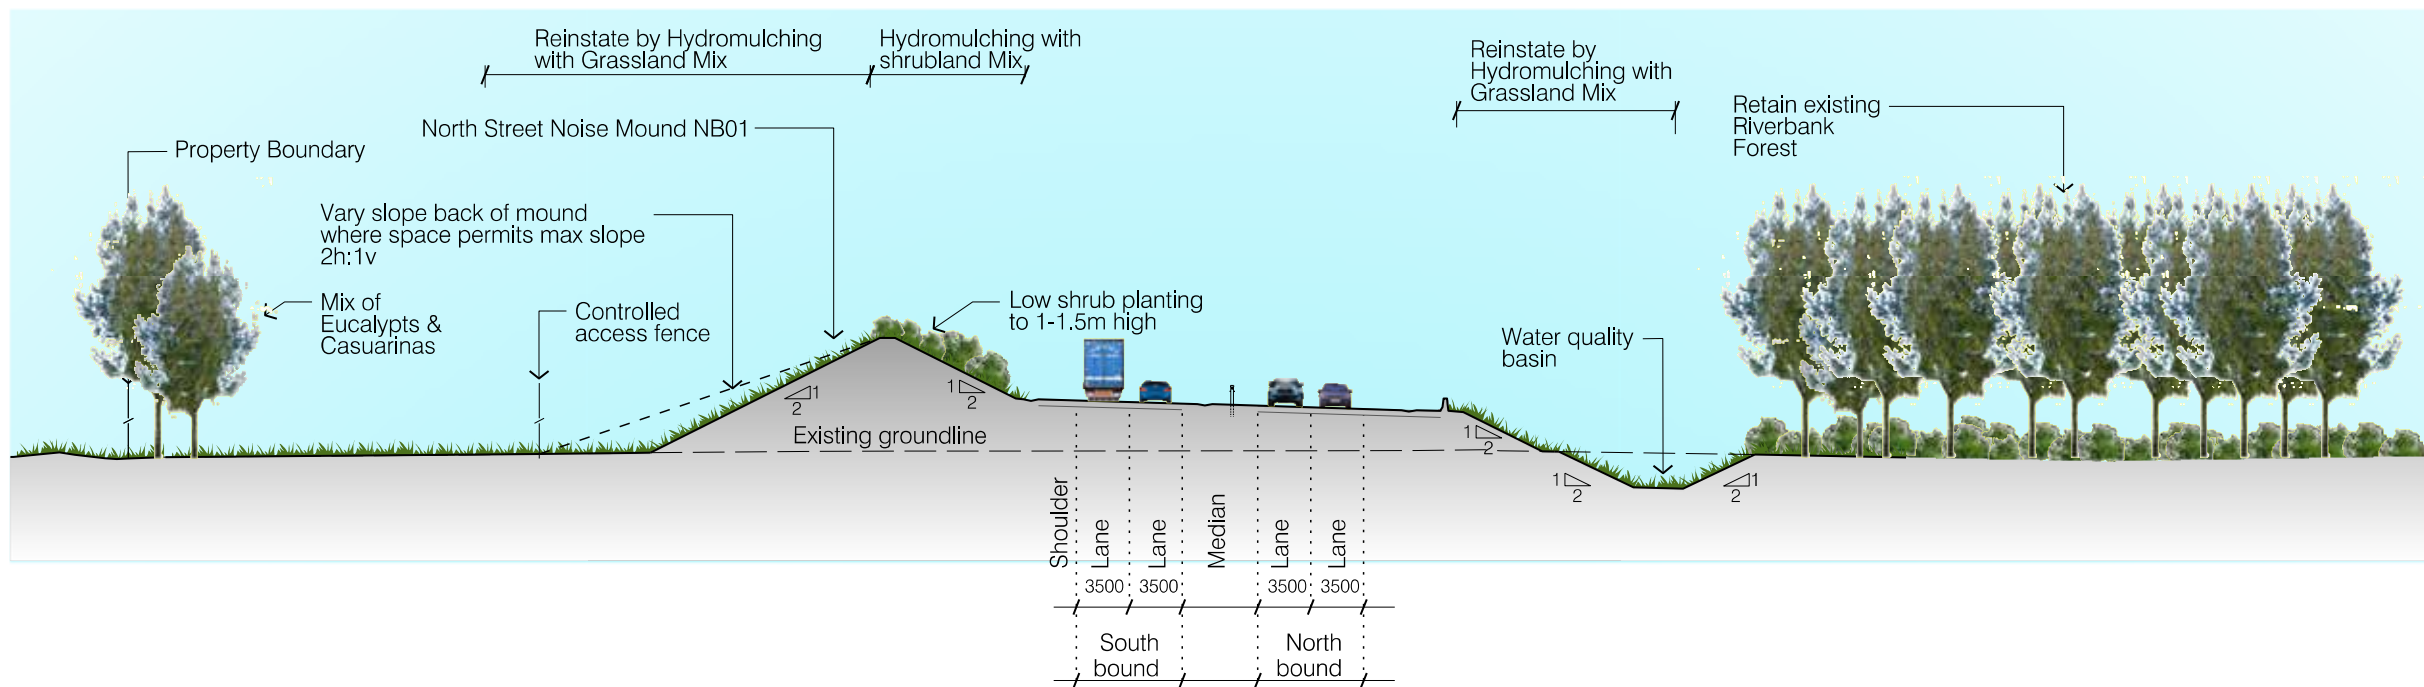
Road cross section at Ch. 16400 (Scale 1:500 @ A3)
